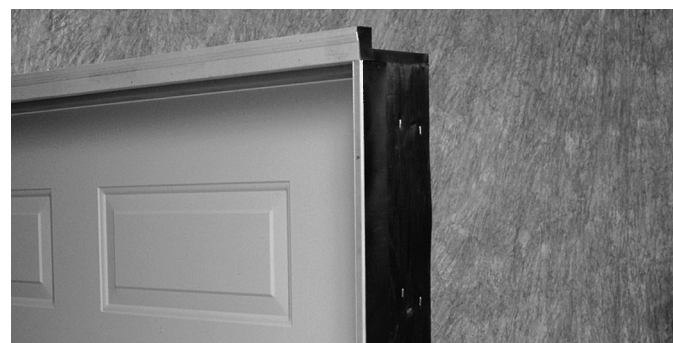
Some door units will be supplied with plastic covers over the bottoms of the jambs. These must be removed before installation.
